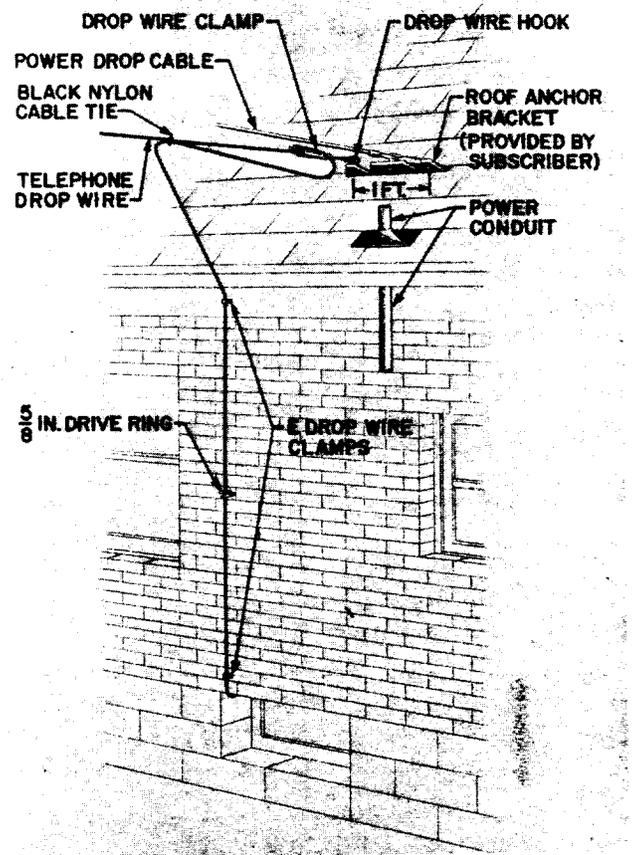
Drop Wire and Power Cable Attached to Roof Anchor Bracket
